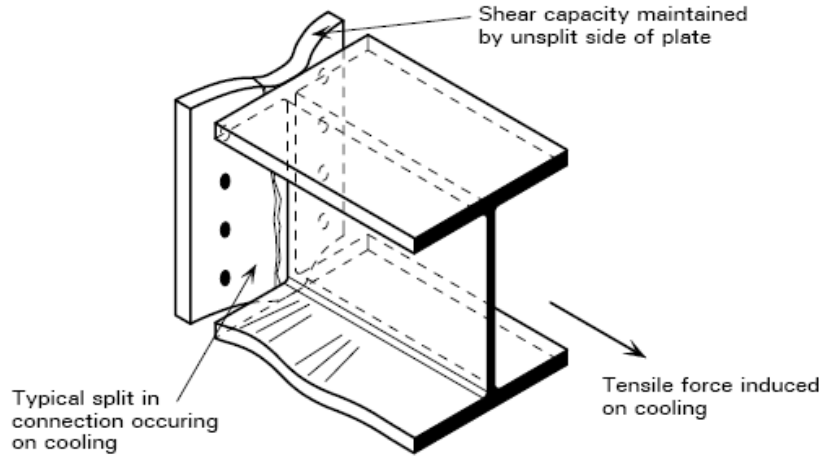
One of two failure modes observed in end plate connections during the Cardington tests (Newman, 2000)
